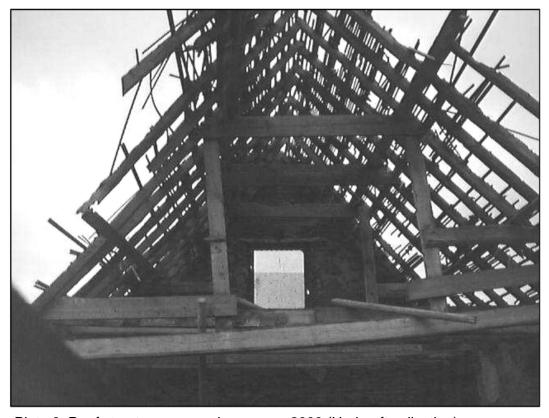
Roof structure over main range, c.2000 (Hadgraft collection)
